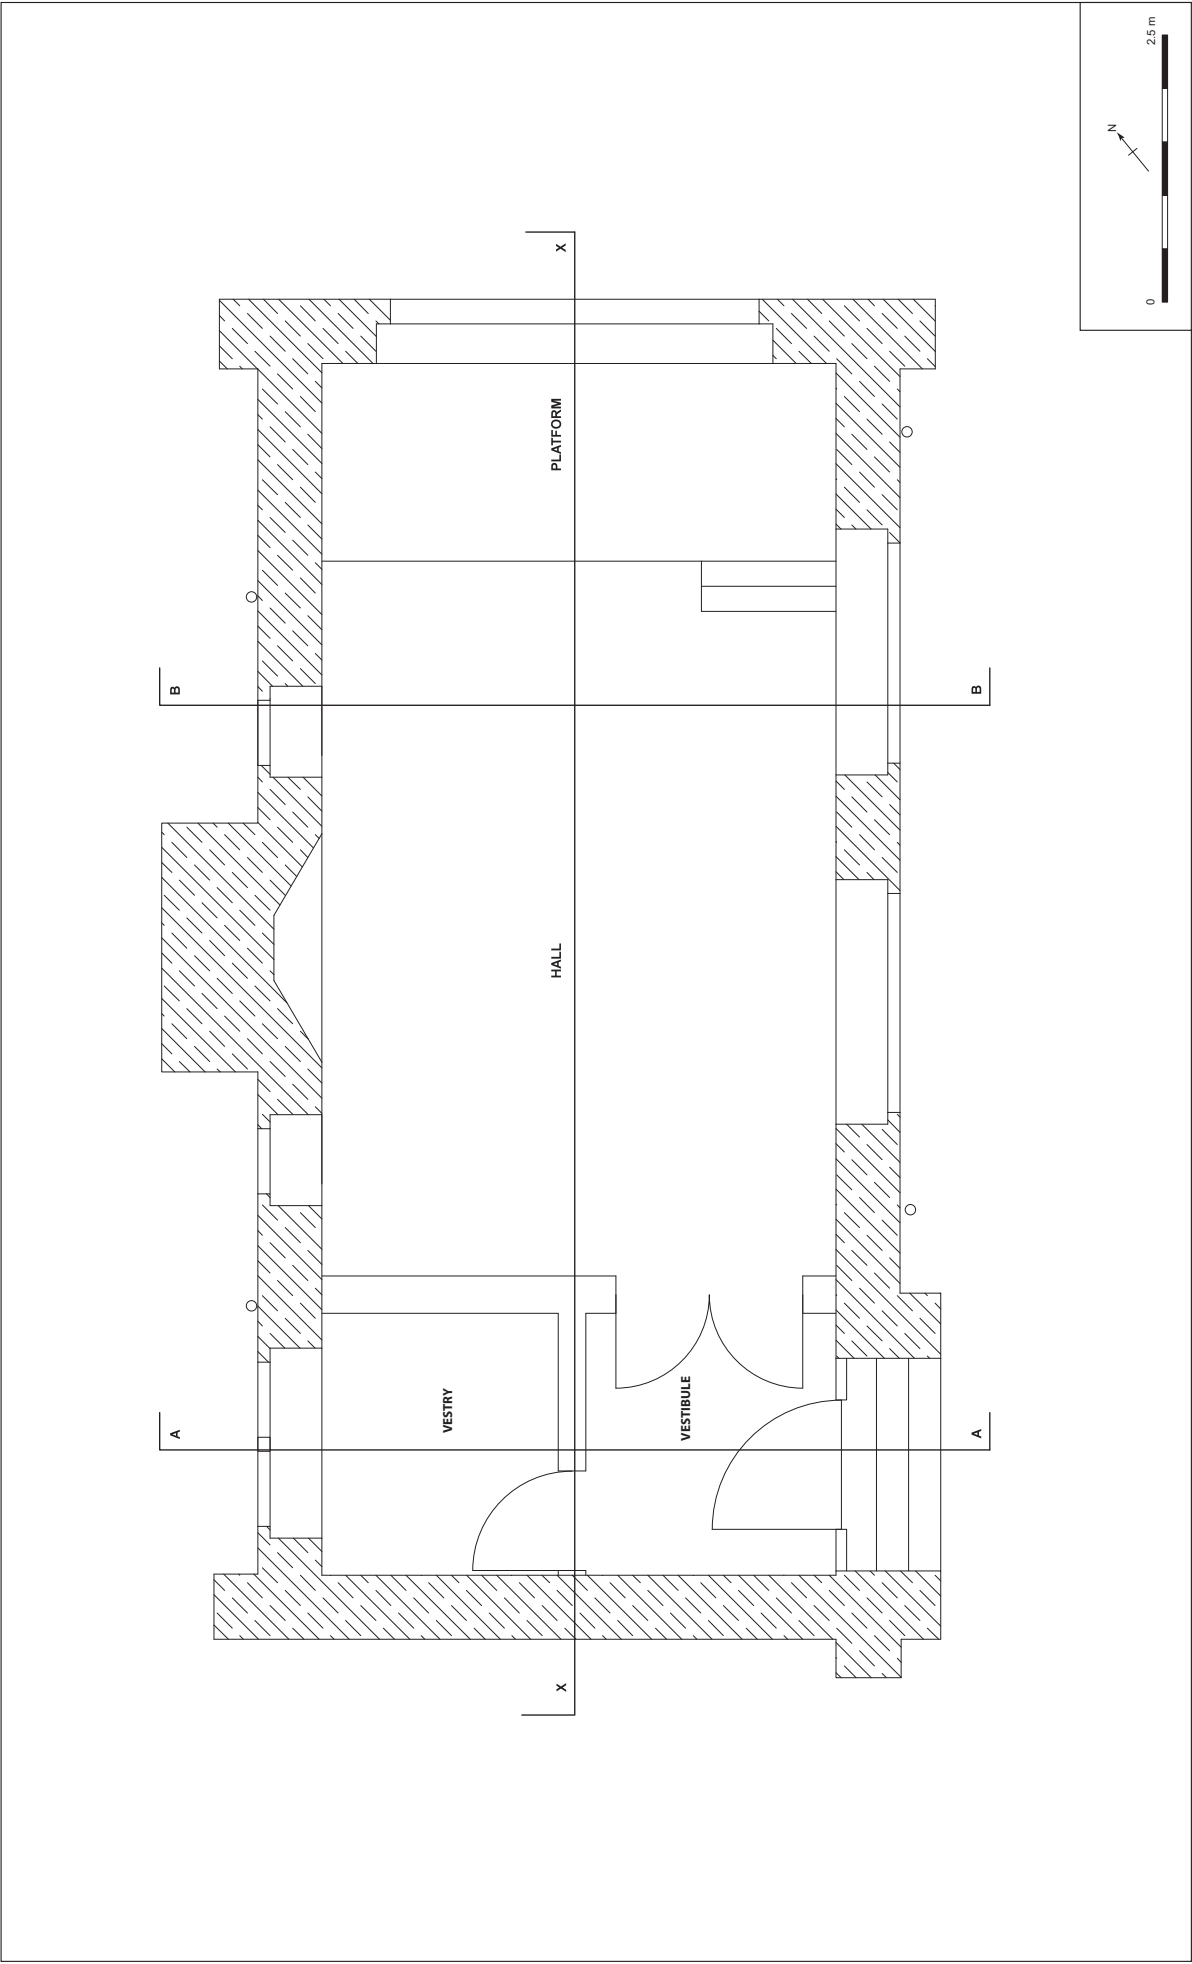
Morenish Chapel, Killin: Existing floorplan.
